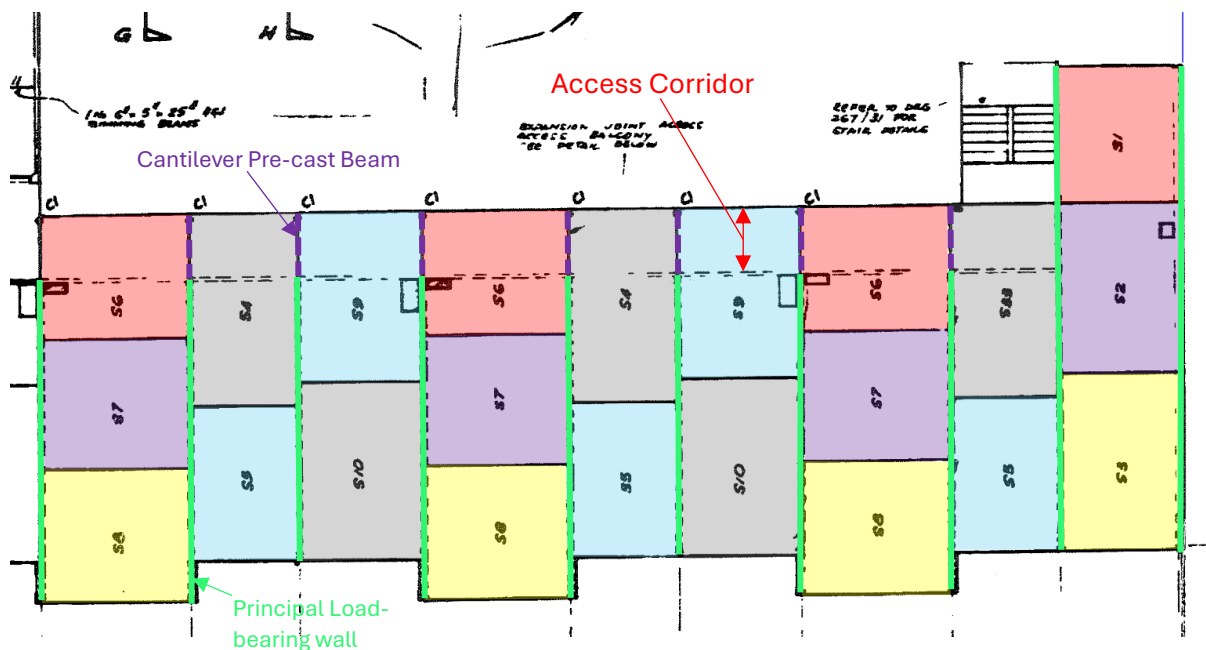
Isolated plan view of east-wing identifying principal load-bearing walls and pre-cast slab segments
